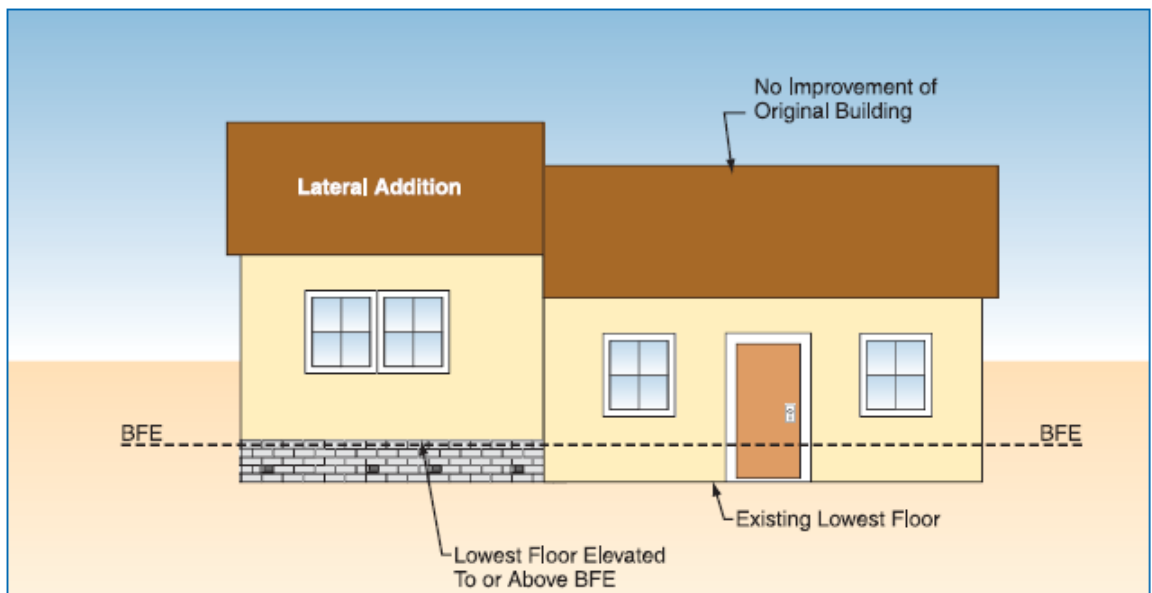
Lateral addition to a pre-FIRM building in an A zone – the proposed work is only the addition (no work was performed on the original building and no structural modification was made to the common wall or roof). The addition constitutes a substantial improvement and it complies with all NFIP requirements.
